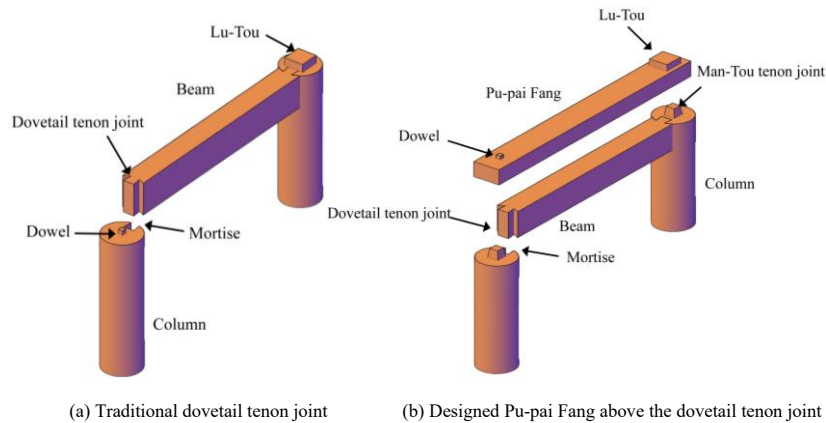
Construction characteristics of Pu-pai Fang-dovetail tenon joints
